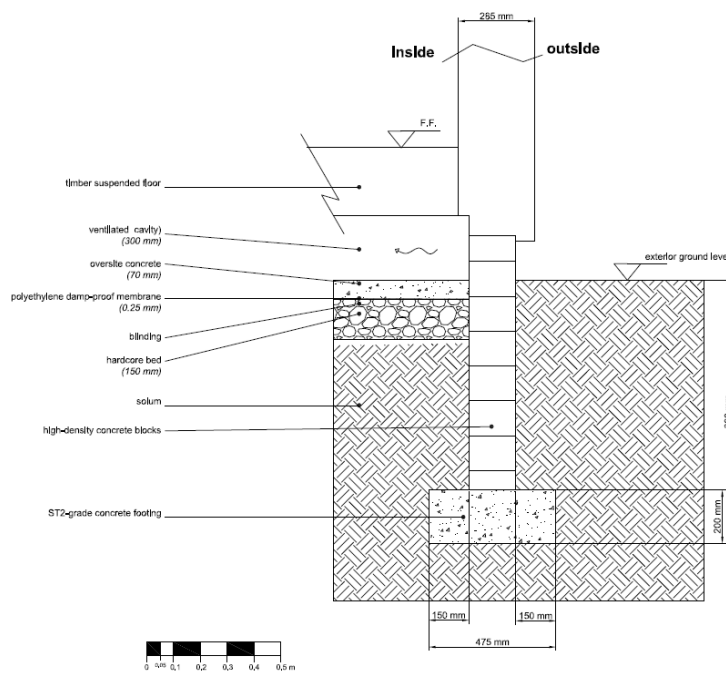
Foundation D2 (strip foundations and suspended floor), vertical section.
